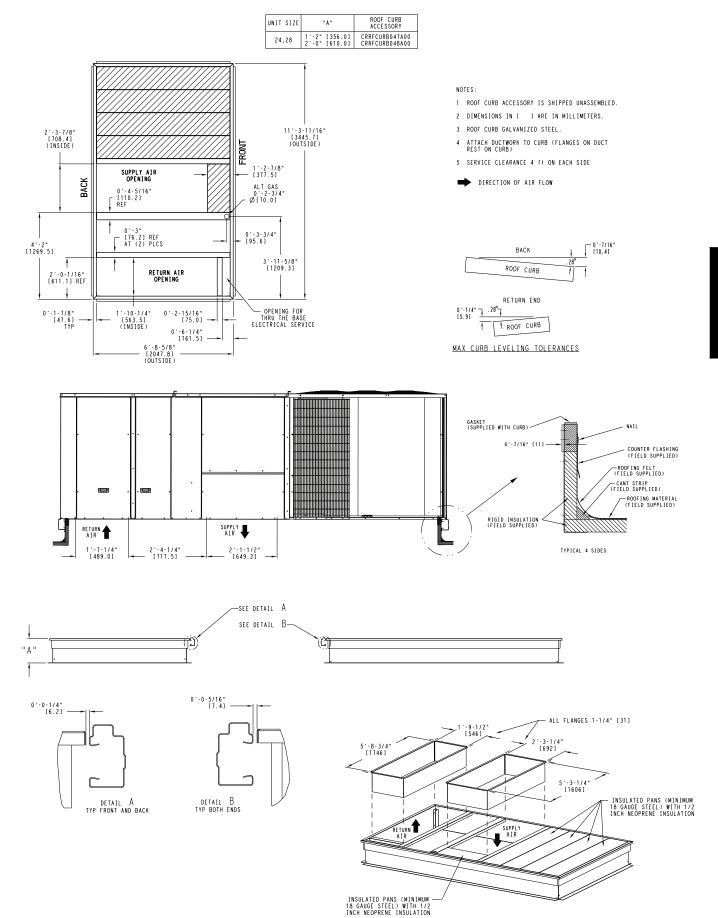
Roof Curb Details - 24 and 28 Size Units
